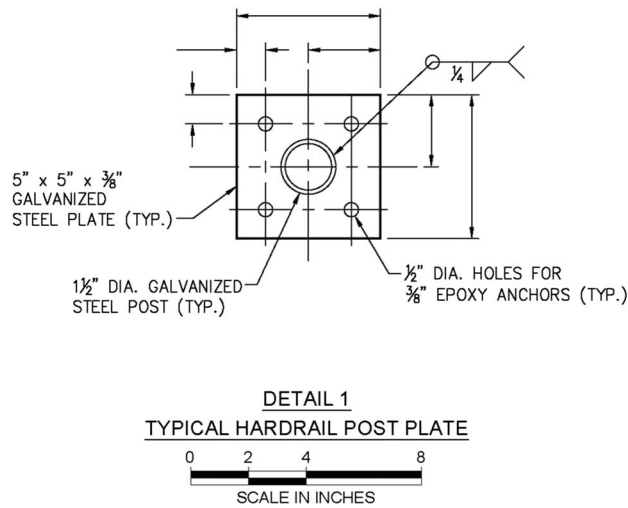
S-21. Dimensioning of Typical Handrail Post Plate
